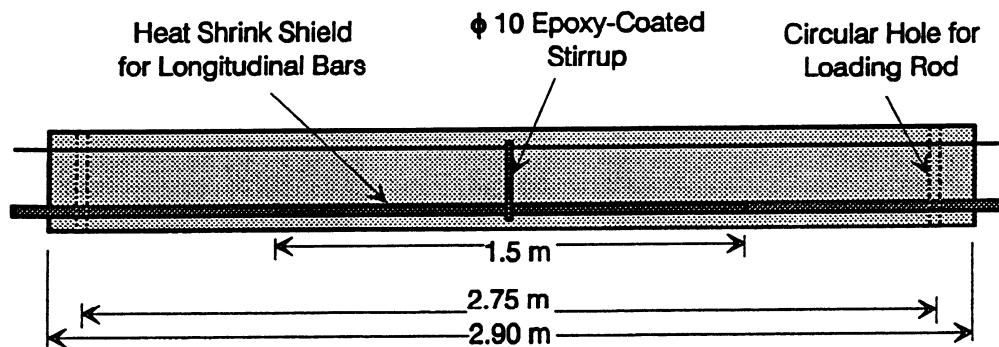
Details of Group II Beam Specimen (Stirrup).
